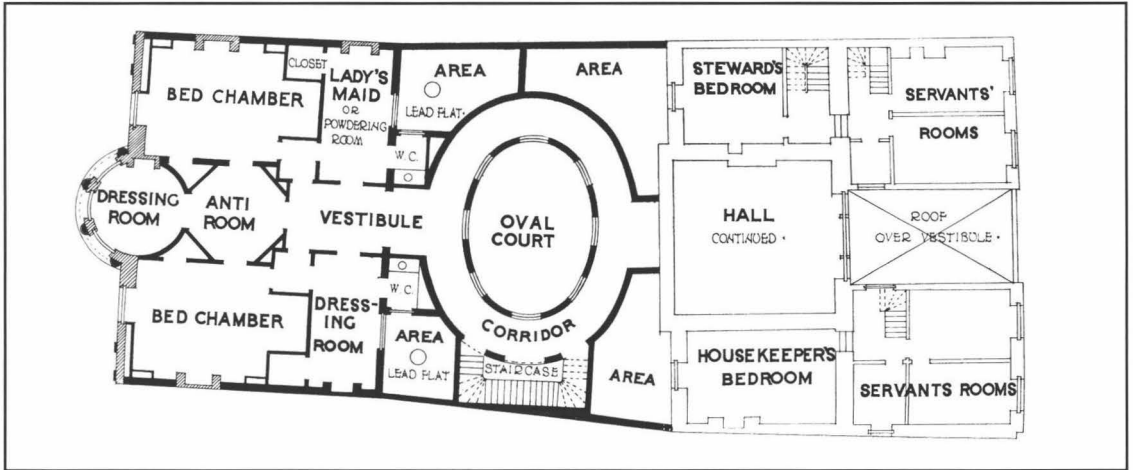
Robert Adam, first-floor plan of Mrs Fitzherbert's house, 1787. (Source: Arthur Bolton, *The Architecture of Robert and James Adam* (1922).)
